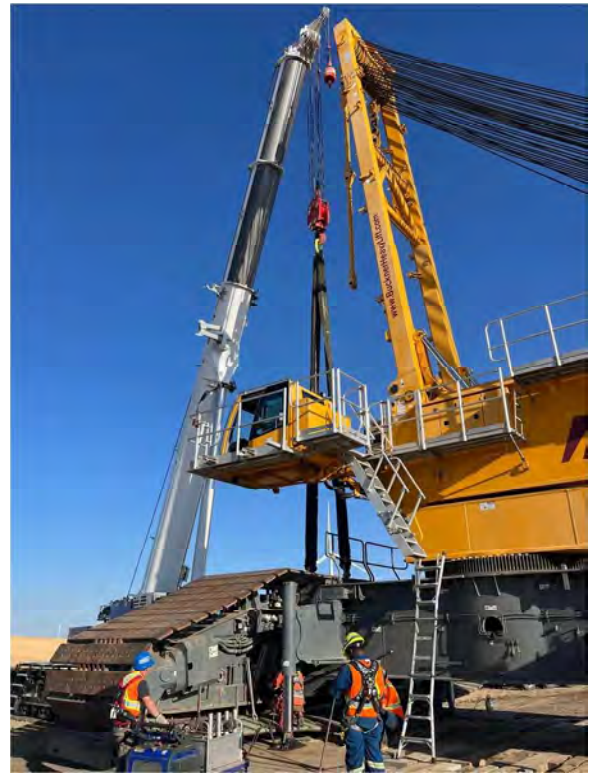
Assembly of Liebherr LR 11000 Crawler Crane (Source: Buckner Heavylift)
